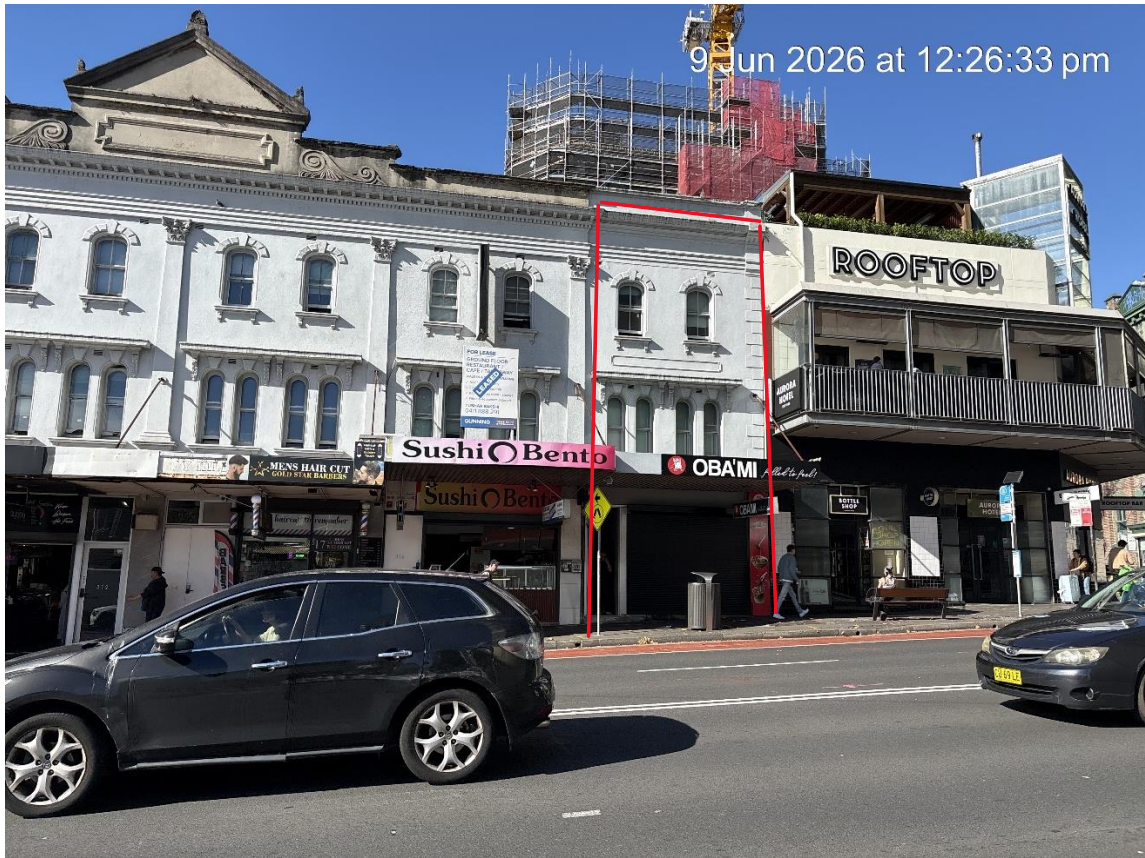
318 Elizabeth Street, Surry Hills viewed from the north-west
